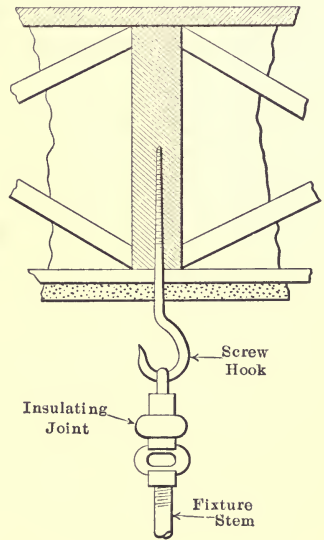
SUPPORT FOR A HEAVY FIXTURE.
